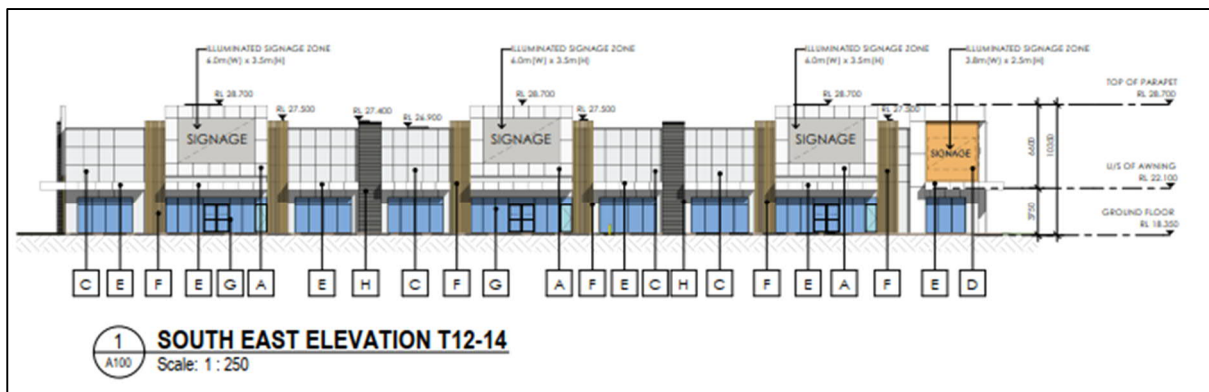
Excerpt of a typical elevation showing the proposed signage (refer Appendix D).
